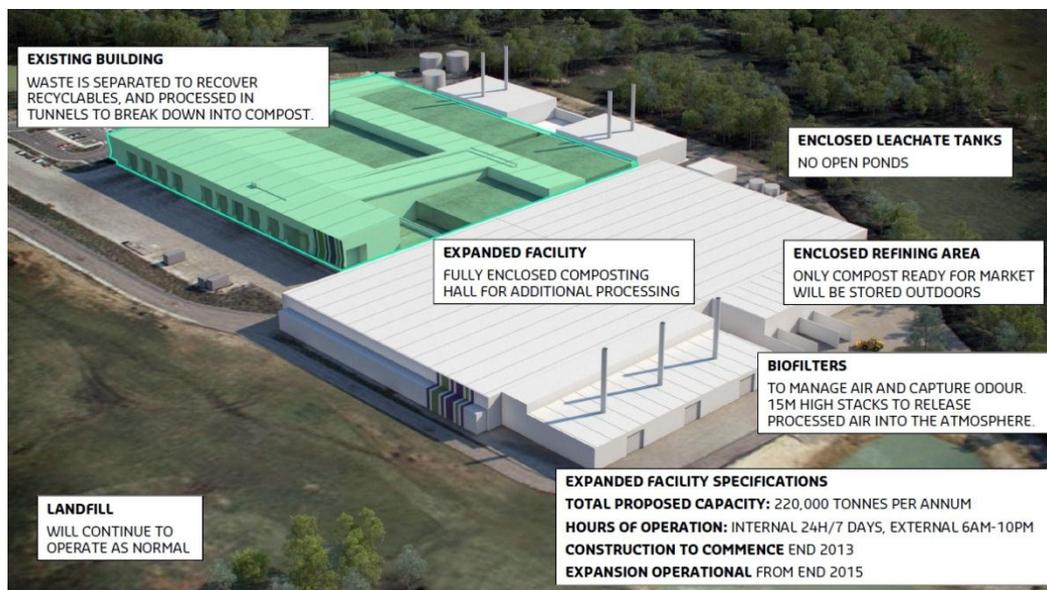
SITA SAWT Facility Kemp Creek – 2013 expansion plans¹
